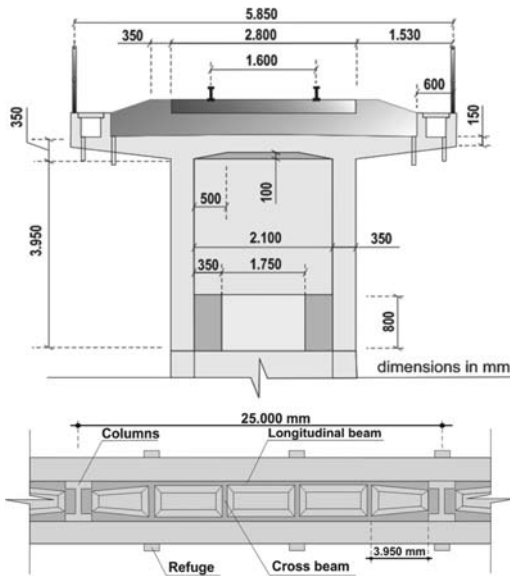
Typical cross section and span for the OAE 40 Bridge (Teixeira et al. 2010).
